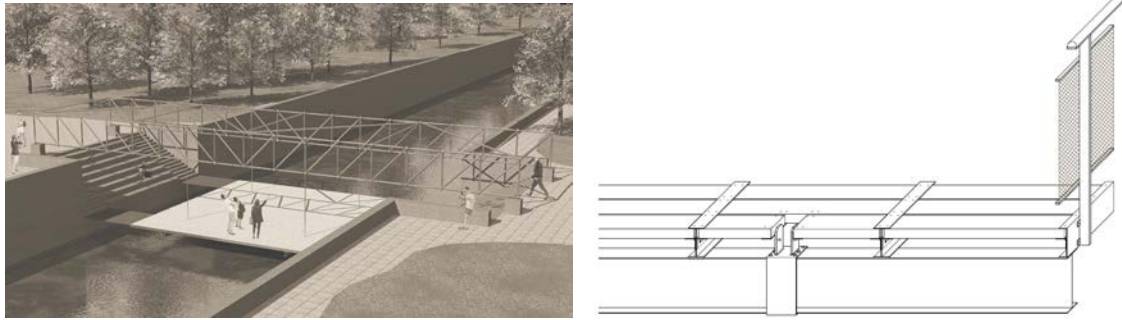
4: Design of a new steel structure responding to a specific architectural requirement
